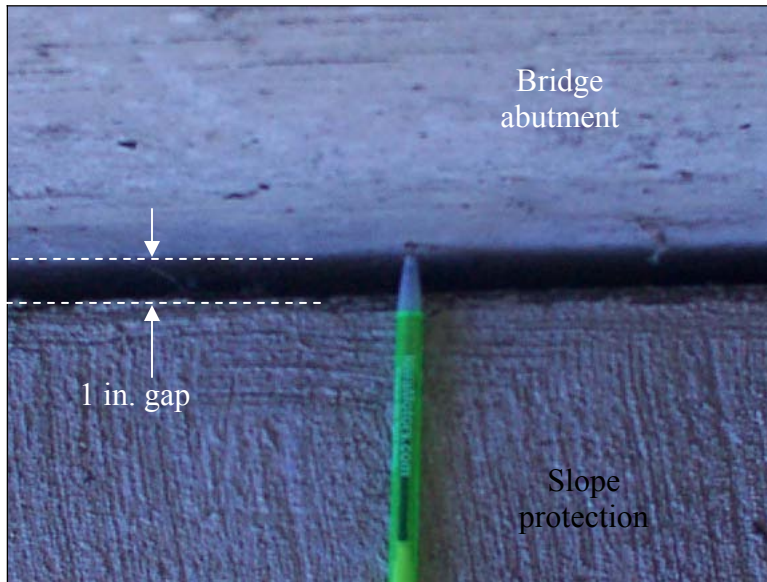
Top view showing a gap between the bridge embankment and the bridge abutment (West end of EBL)
